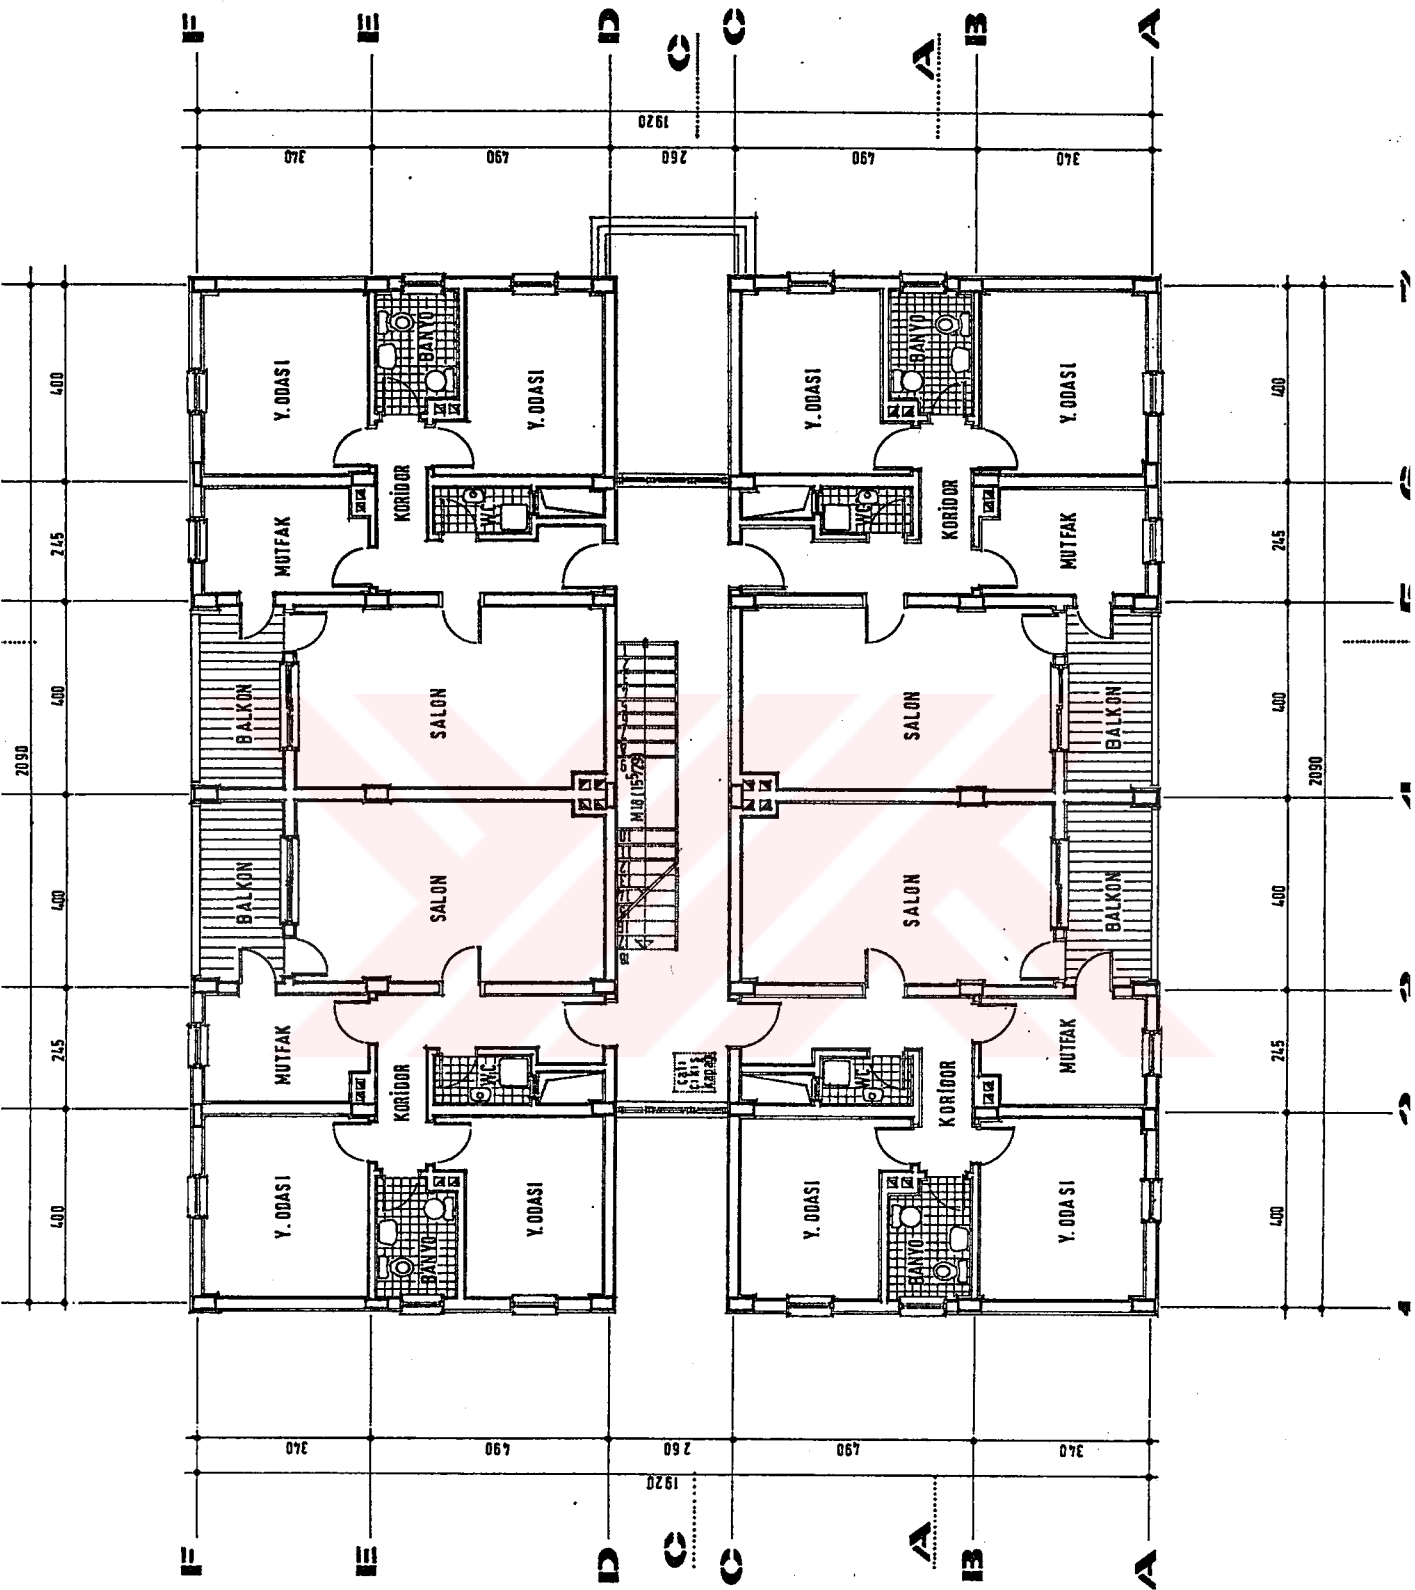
Typical Floor Plan of " Harb-iş 28" Cooperative Houses (Scale 1/200).
